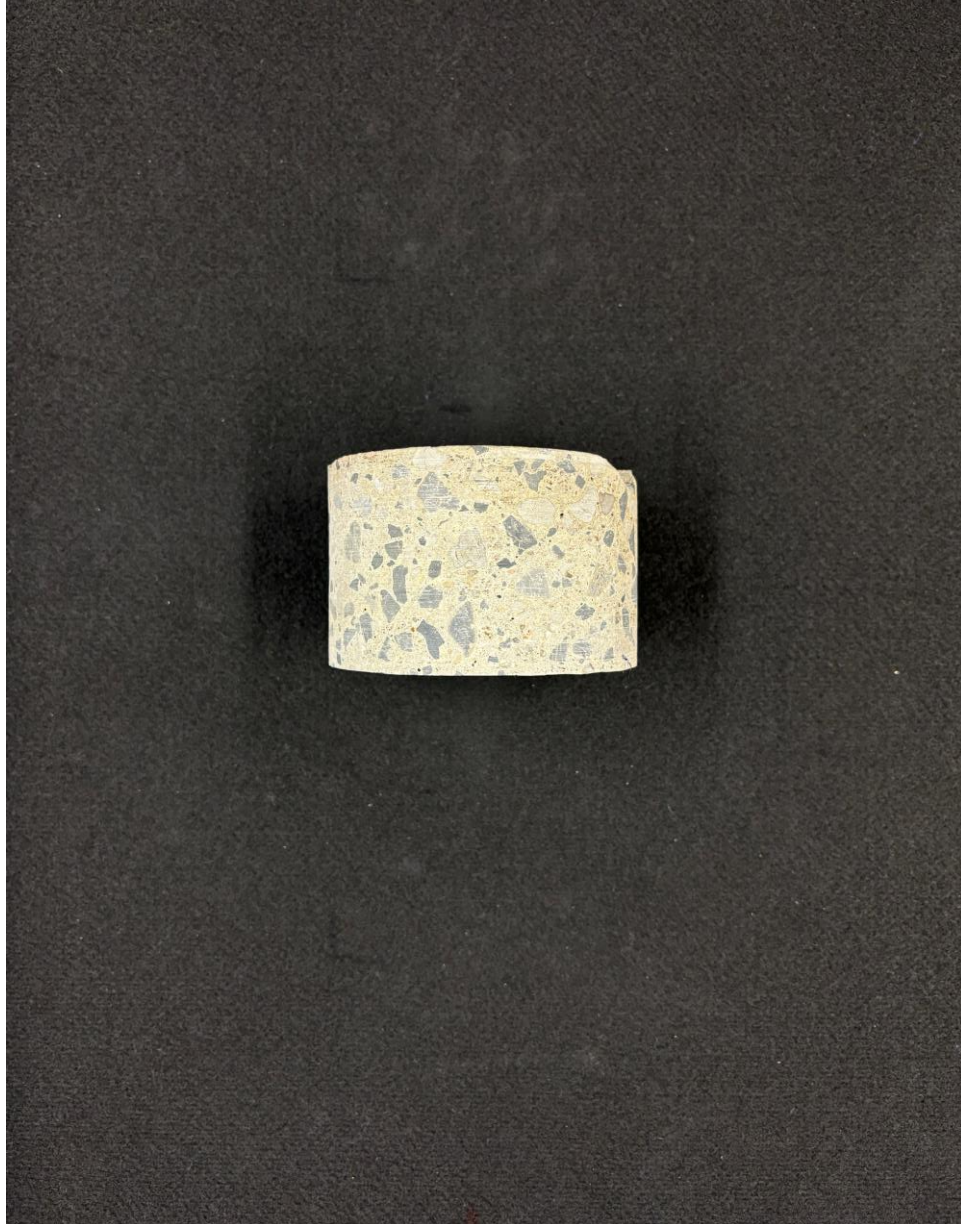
Core 5 of lightweight concrete deck at bridge C-1011.
